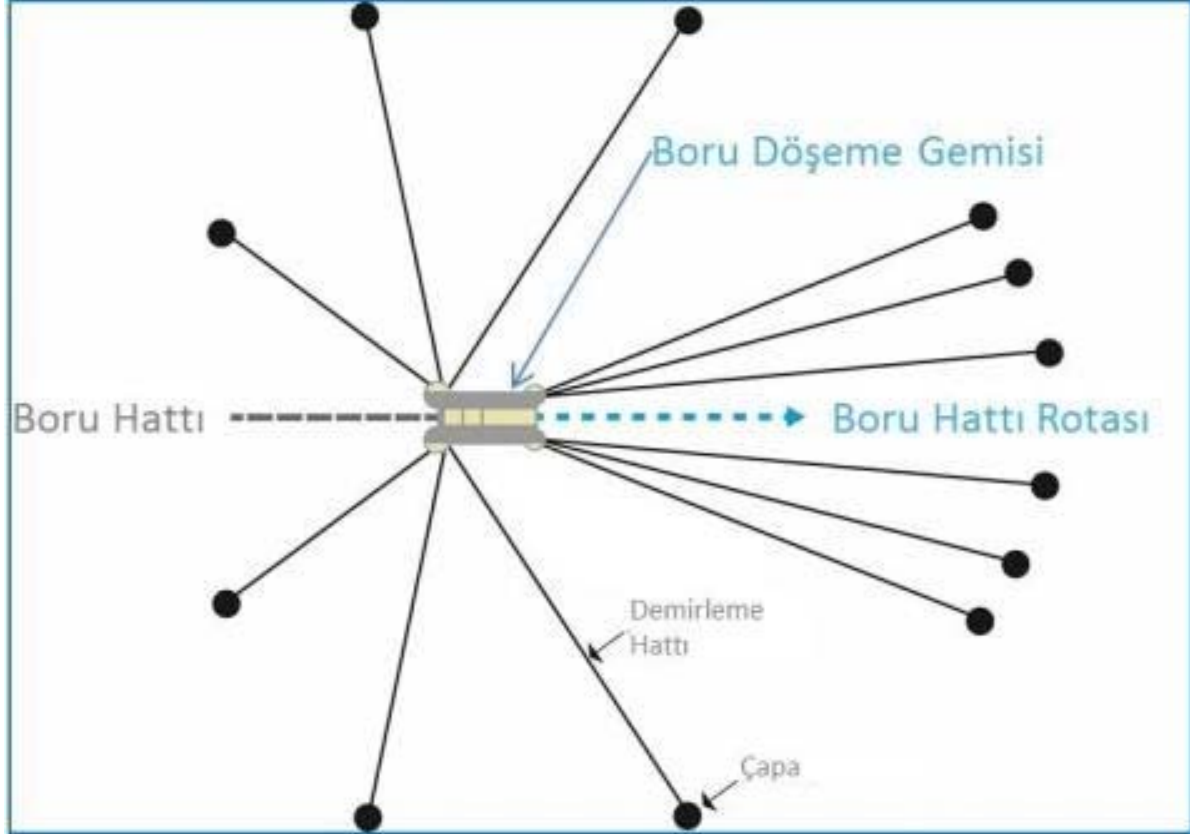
Typical Pipe-Lay Vessel Anchor Spread
